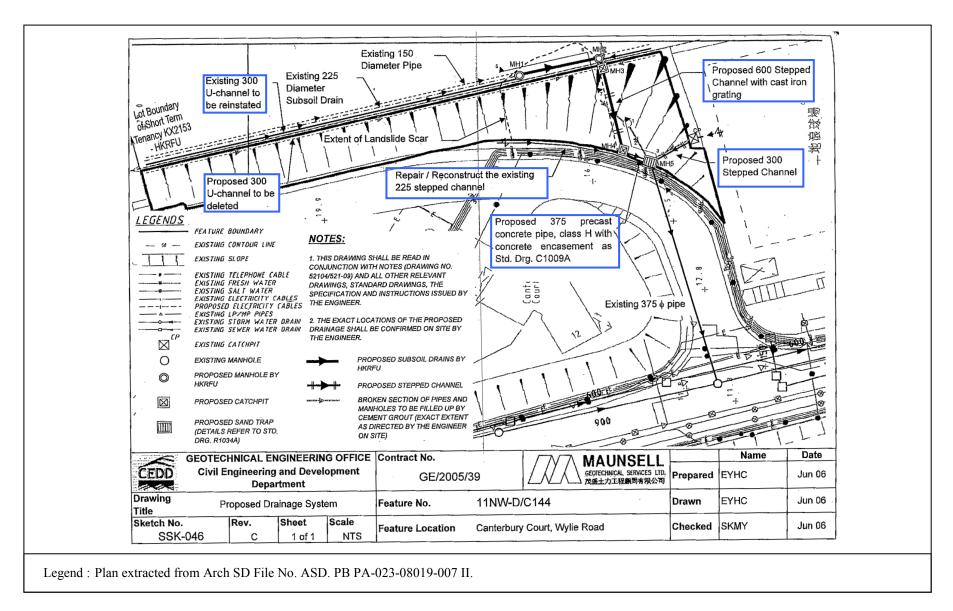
Proposed Drainage System for LPM Works at Slope No. 11NW-D/C144
